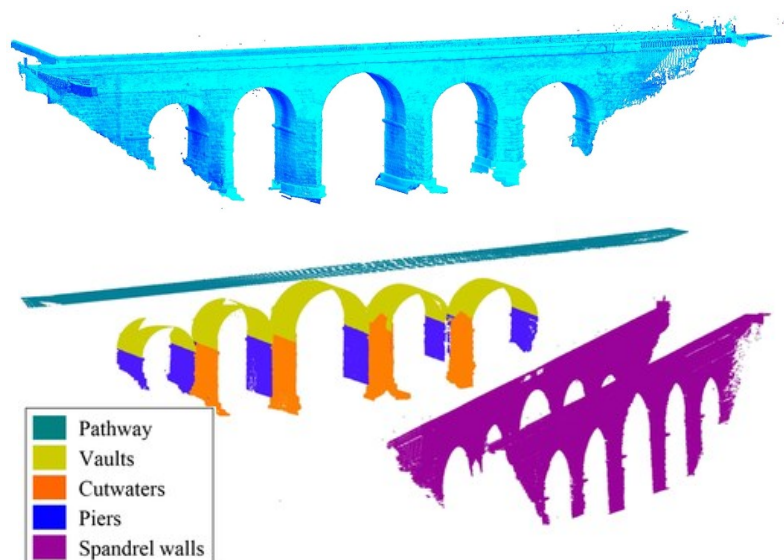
Bridge segmentation and piers identification (Sanchez-Rodríguez et.al. 2018).
